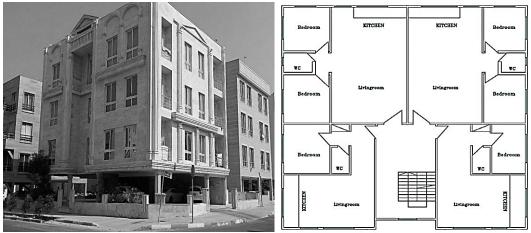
Plan and Elevation of a Typical Apt in Kish
